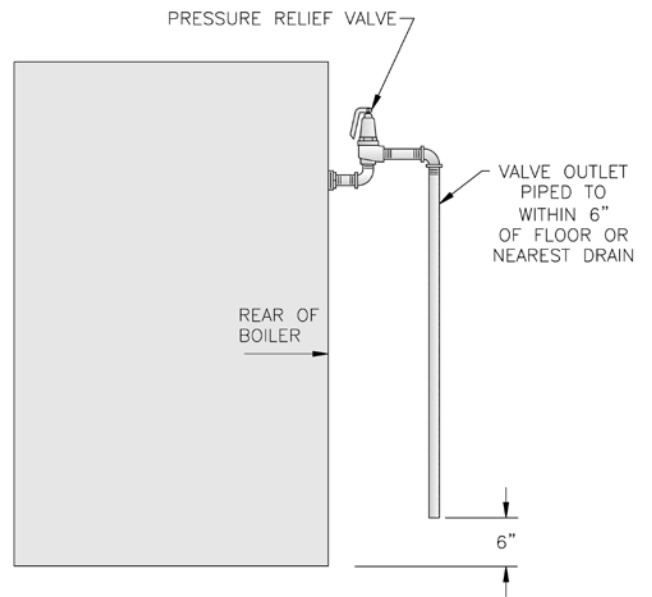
Water Boiler - Pressure Relief Valve Hook-Up
